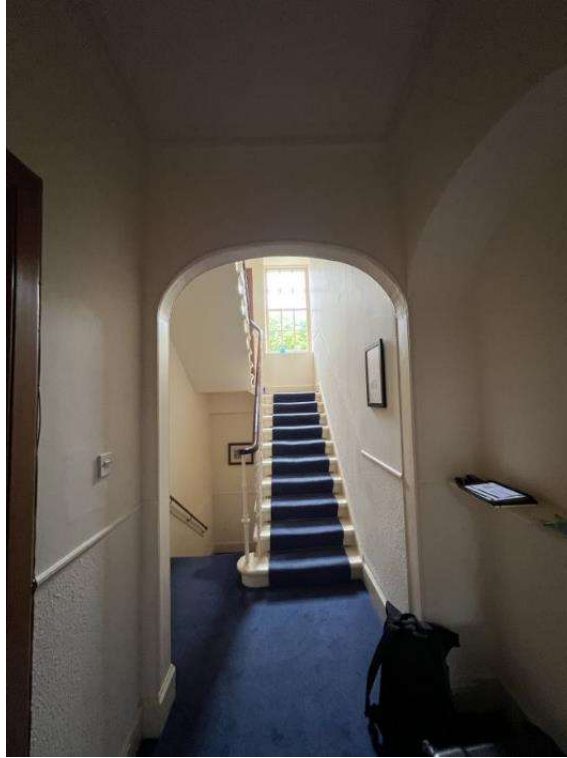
Arch and arched niche in hallway of ground floor, looking east (RKA Architectural Design)
